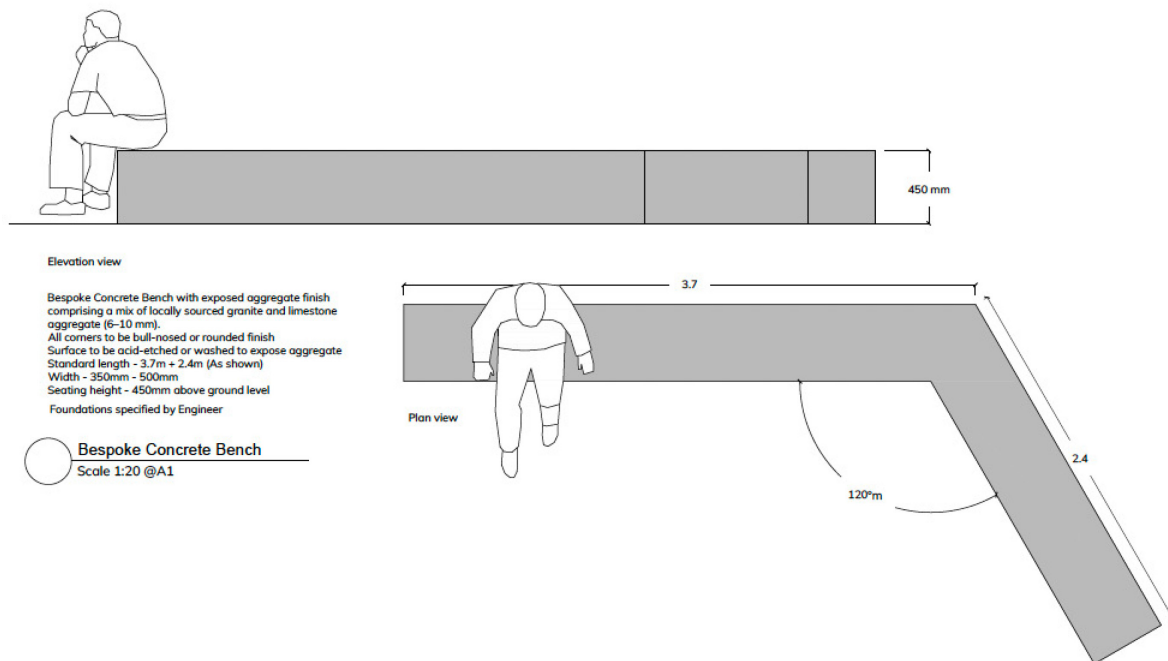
Detail of Hard Landscape Details for bespoke seating with integrated planter proposed Site Layout Plan of Millers Lane (Drawing P612-MIL-LD-HL-303)
